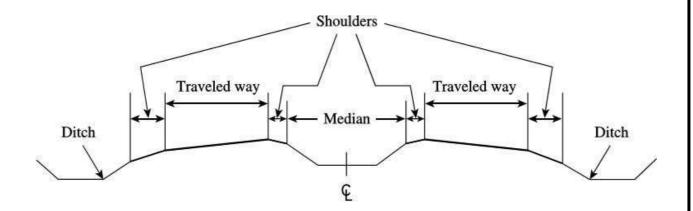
Divided highway cross section, depressed median, with ditches.
